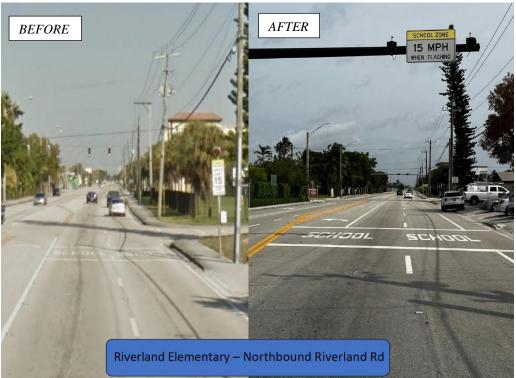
Example of Post-Mounted to Overhead Flashing Beacon Conversion
